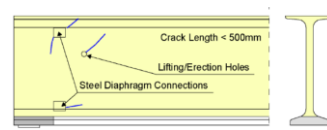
Cracks at stress raisers in NU girders
